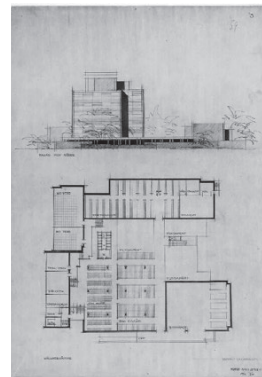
Floor plan and Elevation plan of Handelshögskolan, Gothenburg, Sweden.
